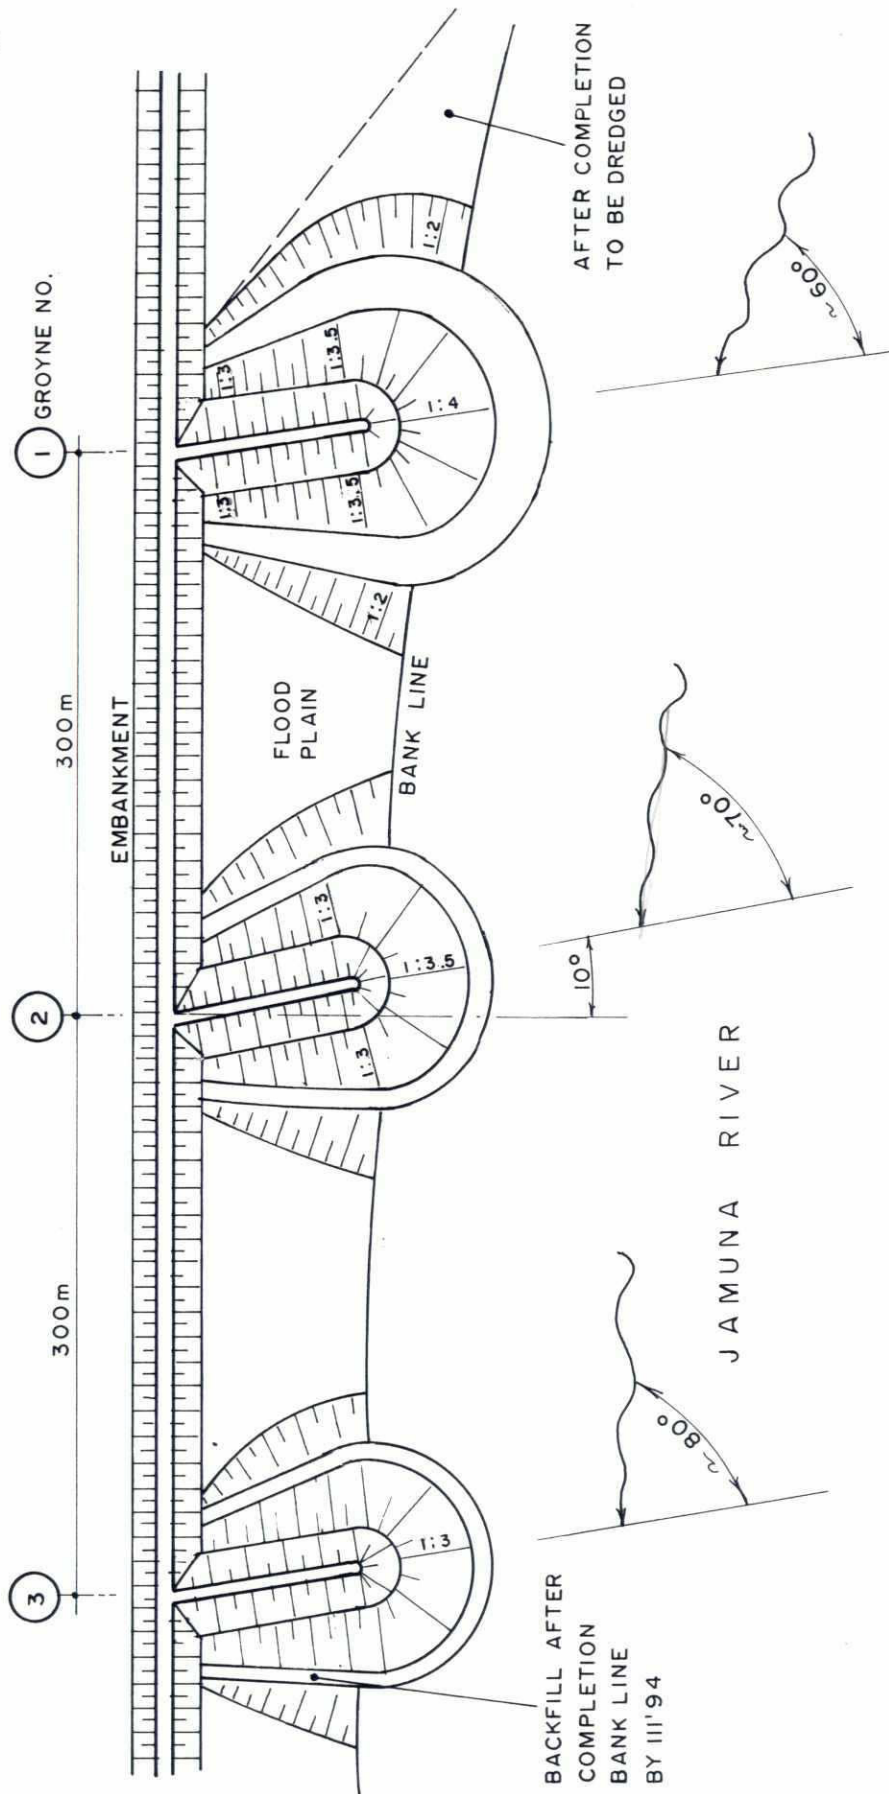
SKETCH FOR TYPICAL GROYPE SECTION
